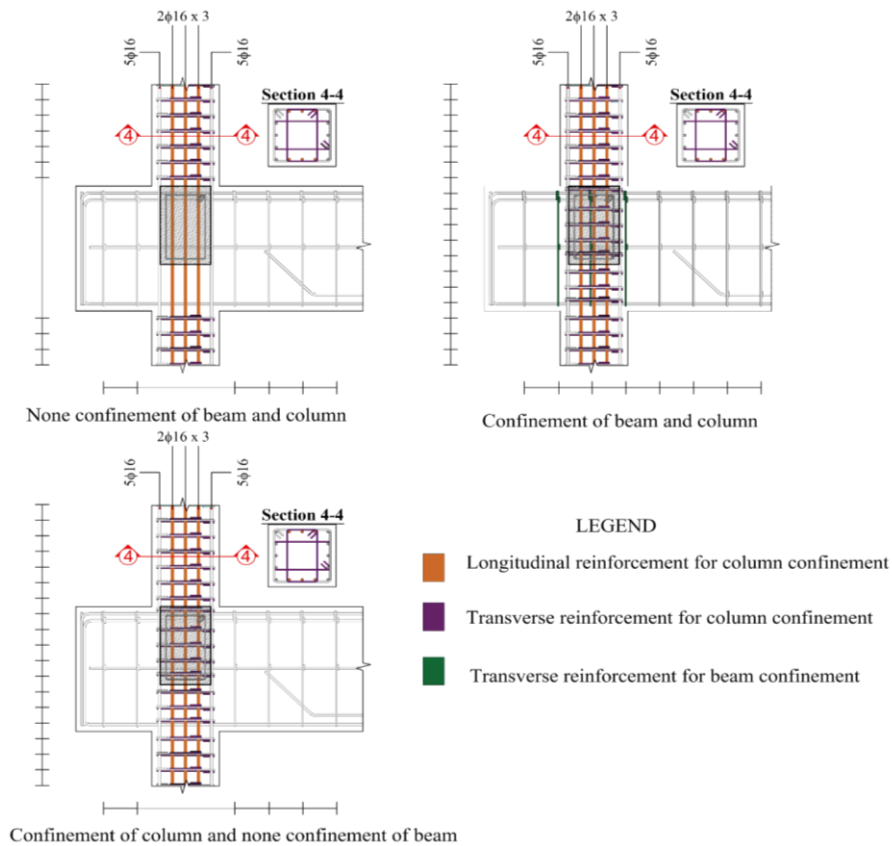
Reinforcement plan of B1 (None confinement), B2 (confinement of beam and column) and B3 (confinement of column and none confinement of beam).
